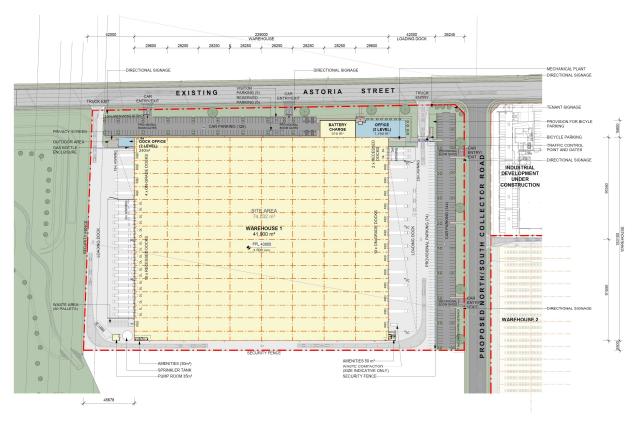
Warehouse 1 Site Plan (Source: Reid Campbell)
